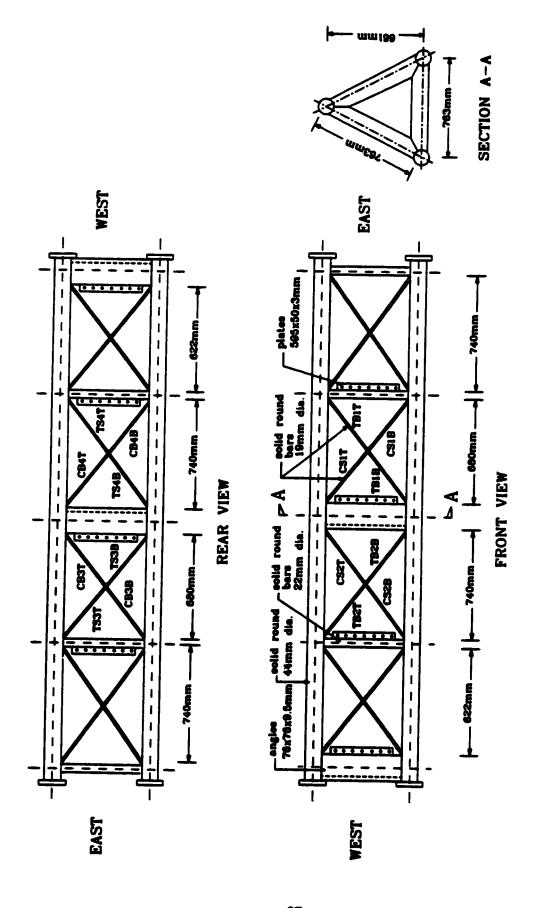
Dimensions of Specimens TR1 to TR4
